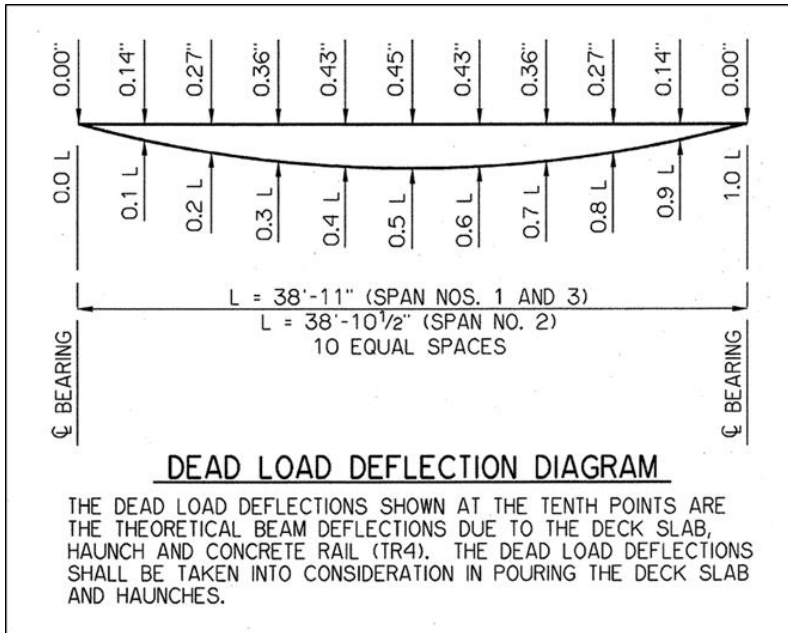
Dead load deflection diagram for Haunch correction – SH 14 Bridge
